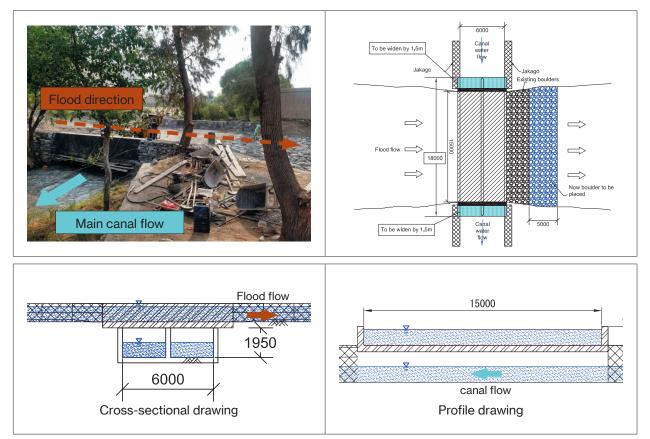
Flood Crossing Bridge Installation in the Flood Crossing Point²⁾
